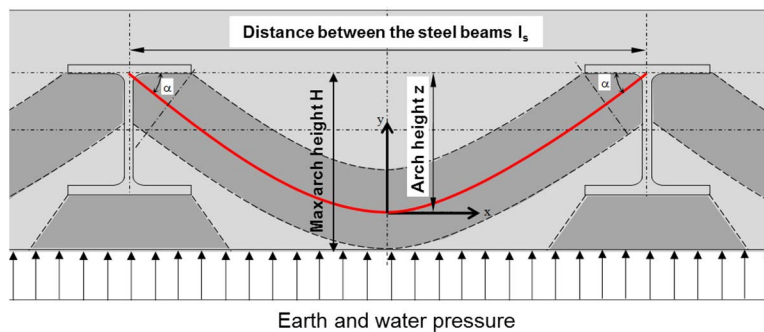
Working principle of a soil mix retaining wall and illustration of the arching effect
